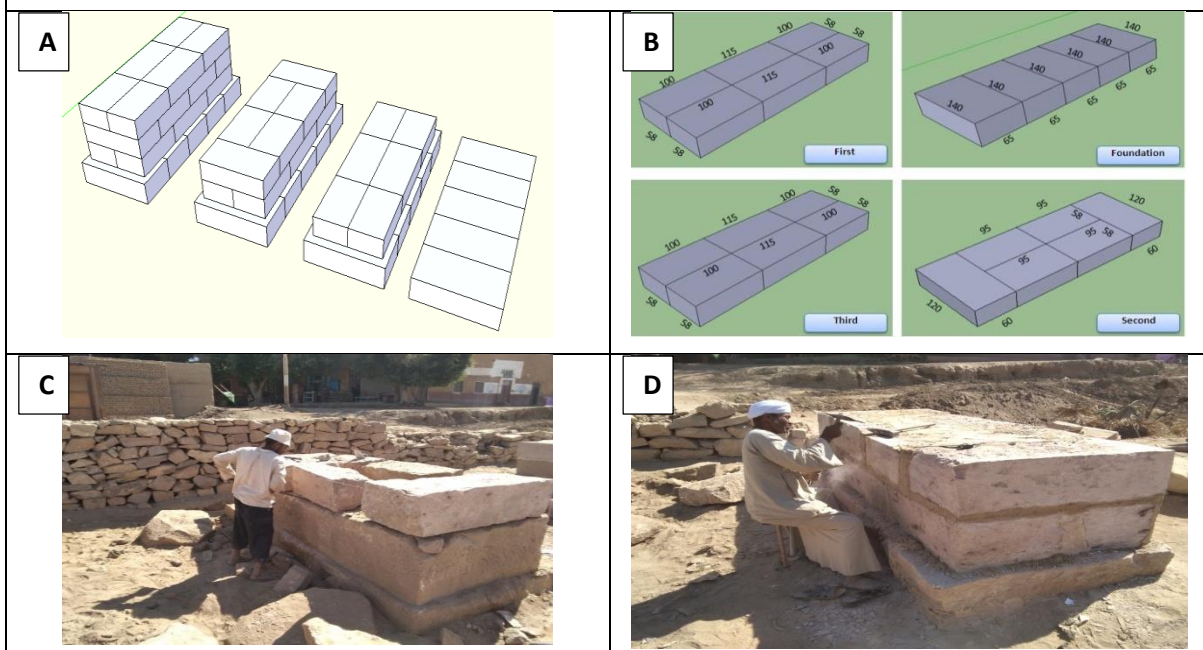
Shows the statue's base building method and its dimensions (Drawing and Photo: Author).
